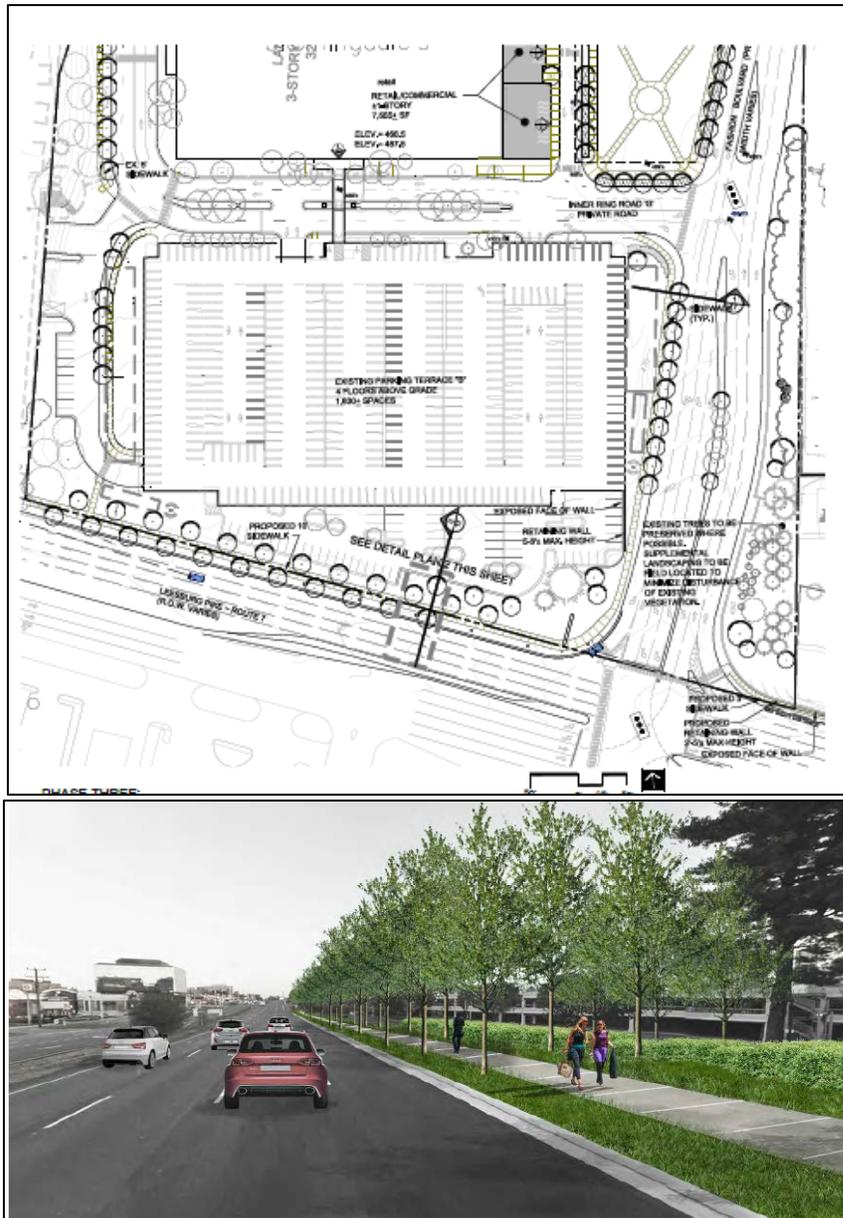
Plan View and Rendering of Leesburg Pike Streetscape
